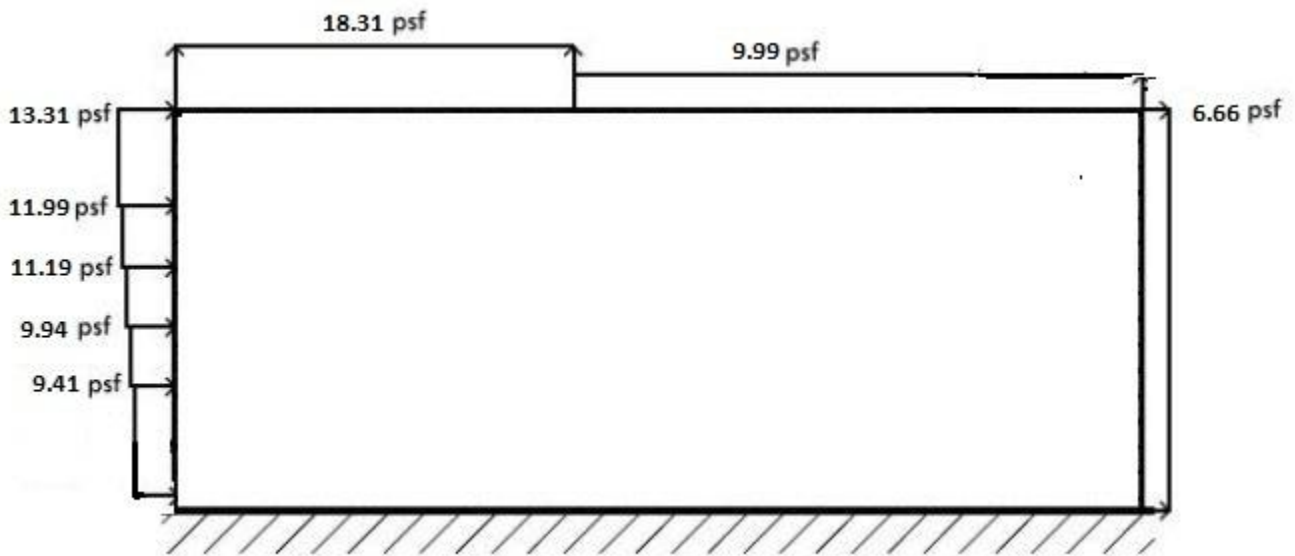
Wind Pressures acting on the West Wing, North and South facades
